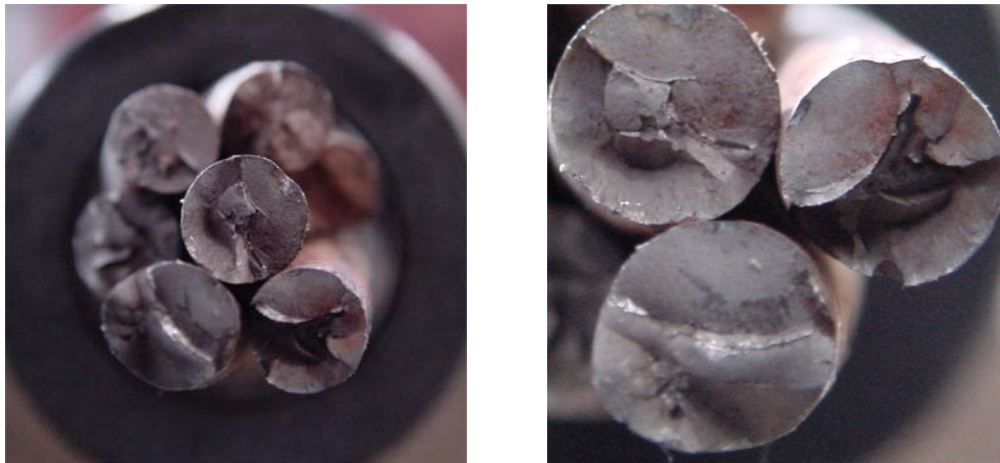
Wire Breaks – Strand #2 – Tower Anchorage – Specimen #1
